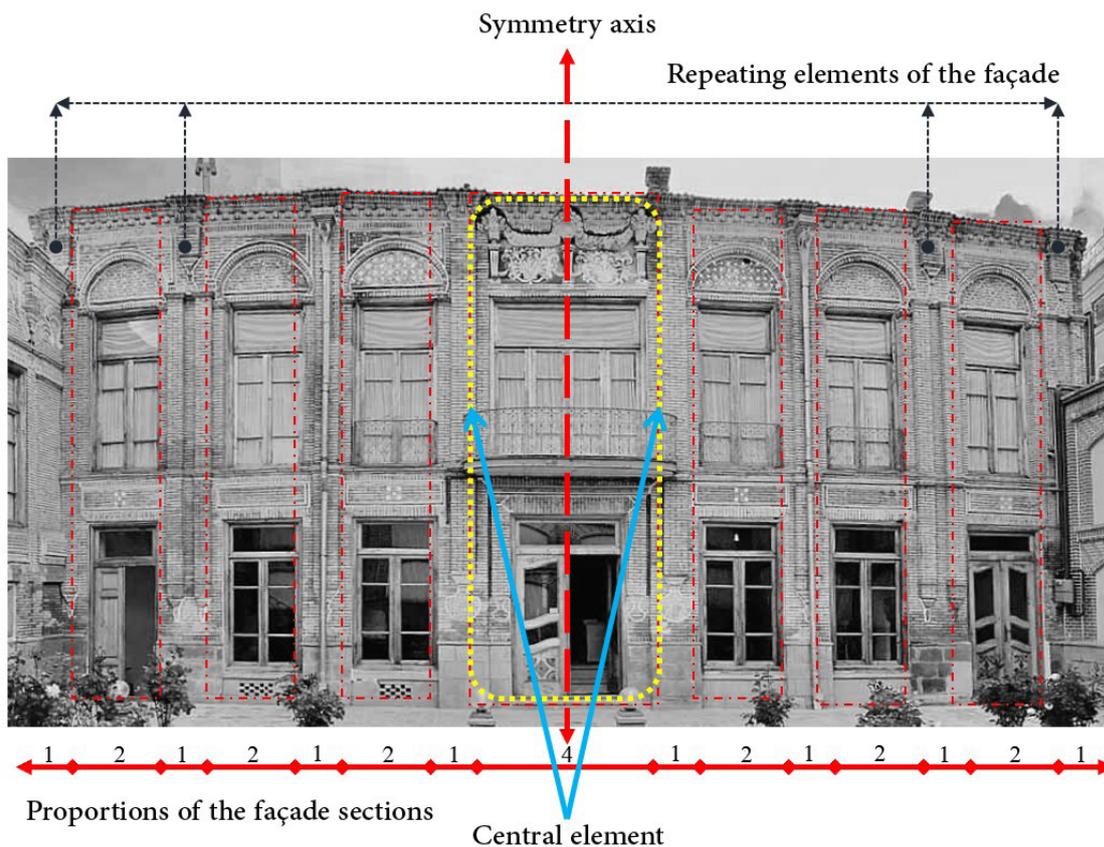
Aesthetic elements in the facade of Amir Parviz historical house with a flat facade pattern. Source: Authors.
